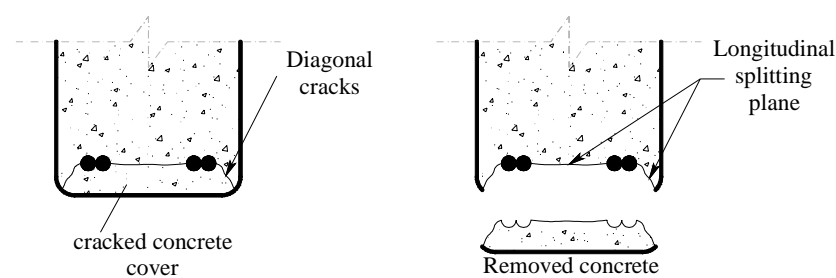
Horizontal splitting plane of a PTMS confined specimen
